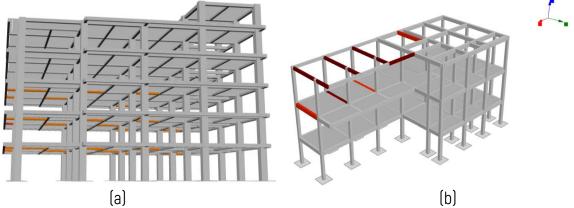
Location of structural member failure per member shear forces of (a) soft-story building at OL and (b) re-entrant building at CP.
